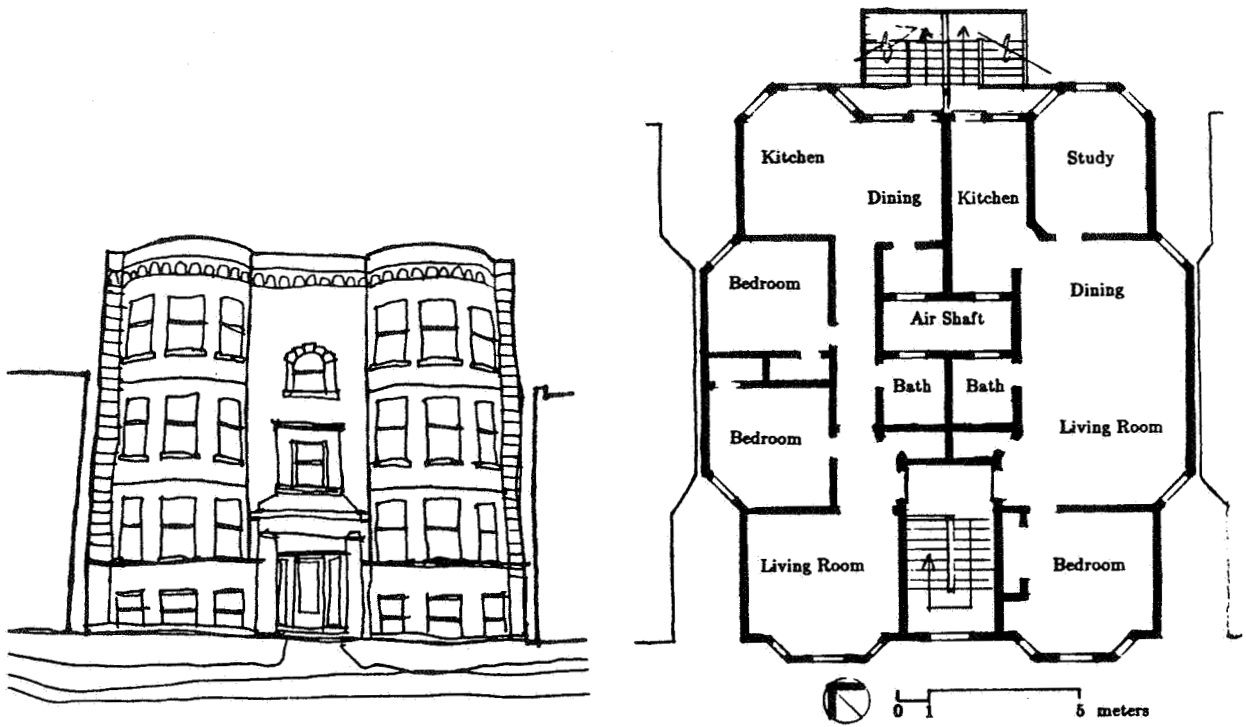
Plan and elevation for Albany, (Chicago, c. 1920).
